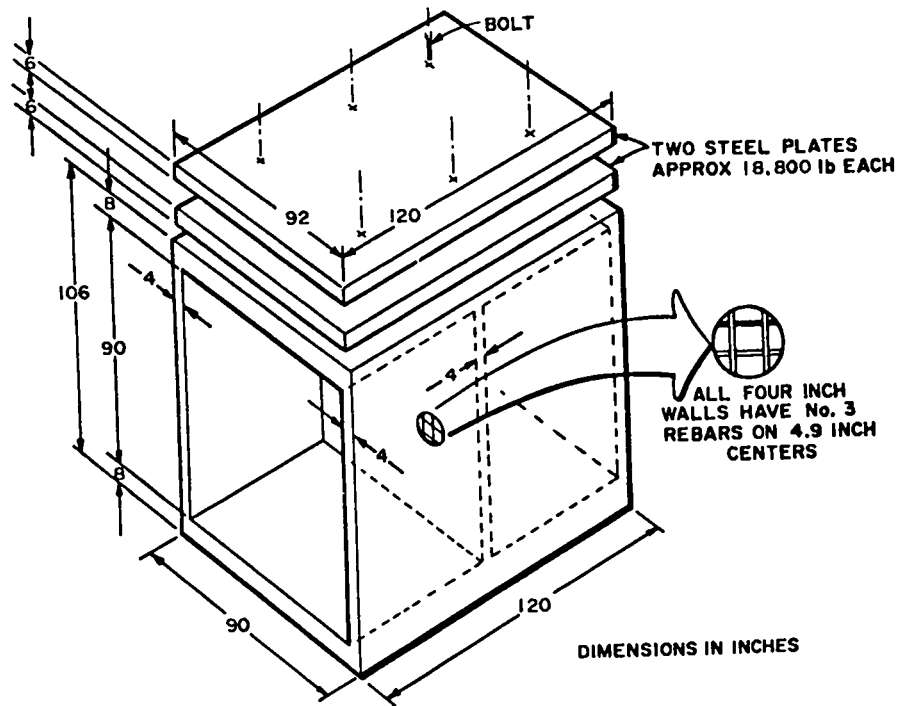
Structure proposed to meet the TRG requirements (hence, "TRG structure").
